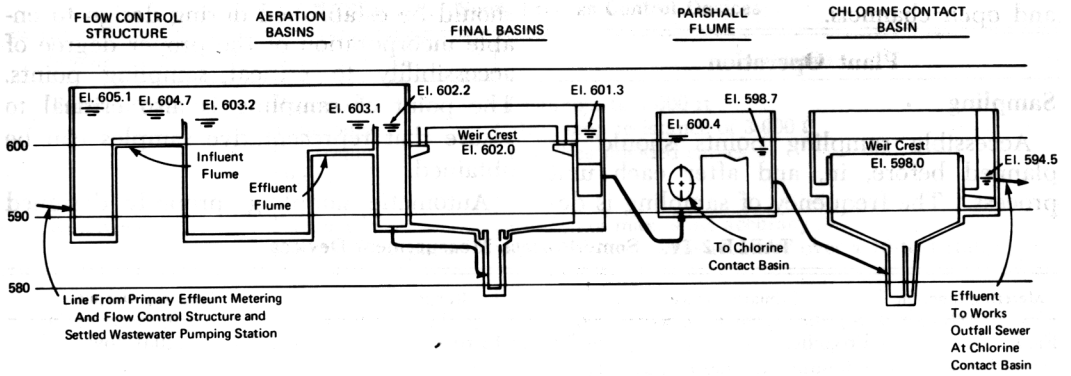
Typical hydraulic profile for an activated sludge plant. Water surface elevations are as shown when flow is 160 000 m³/d (42 mgd).
